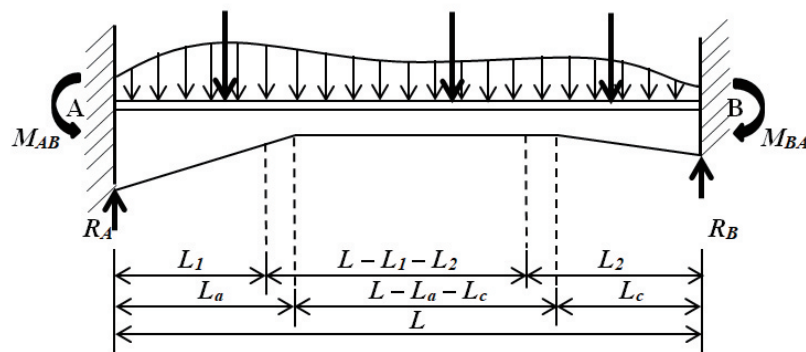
T-section beam with straight haunches at the ends under any type of vertical load
